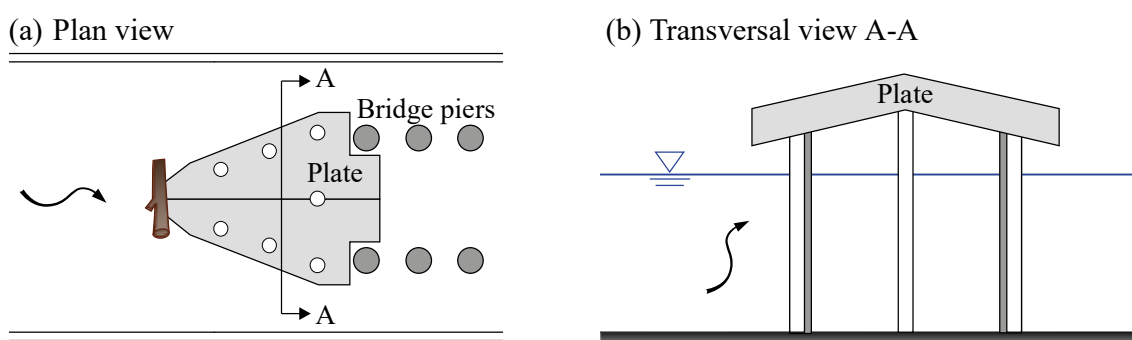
Plate as a countermeasure at bridge pier rows (adapted from Franzetti *et al.* 2011)
